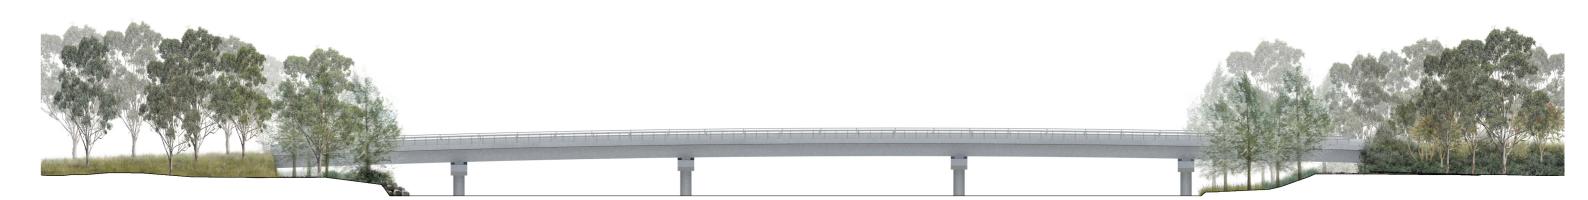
Elevation of the new bridge which shows the pier spacing and height of the structure.
